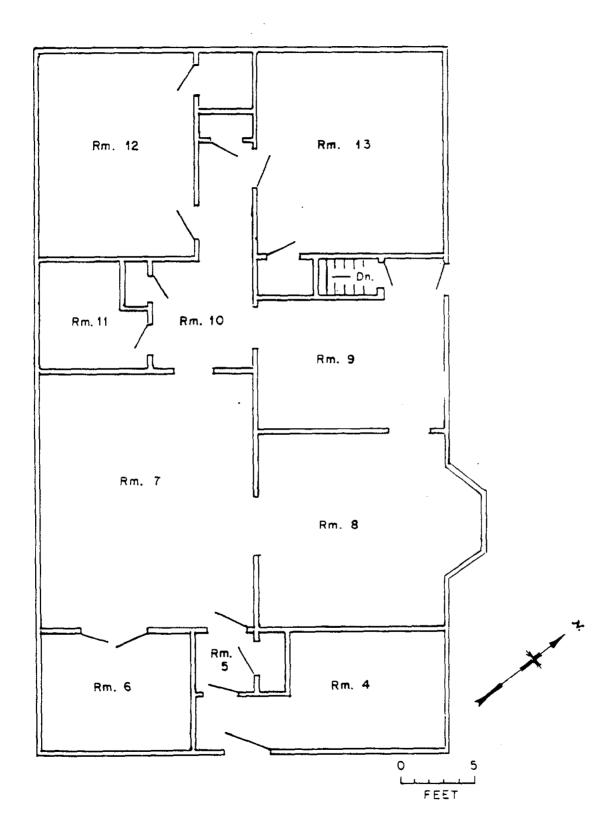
Location of rooms on top floor at 475 Davison Avenue.
